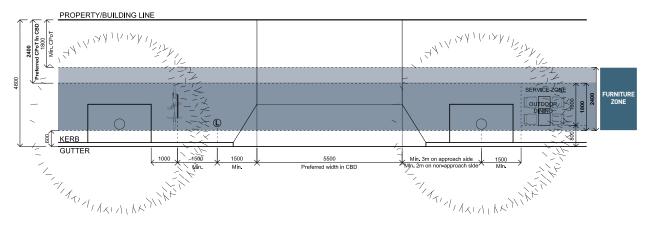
Typical Element Arrangement Diagram - 4.8m Wide Footway
